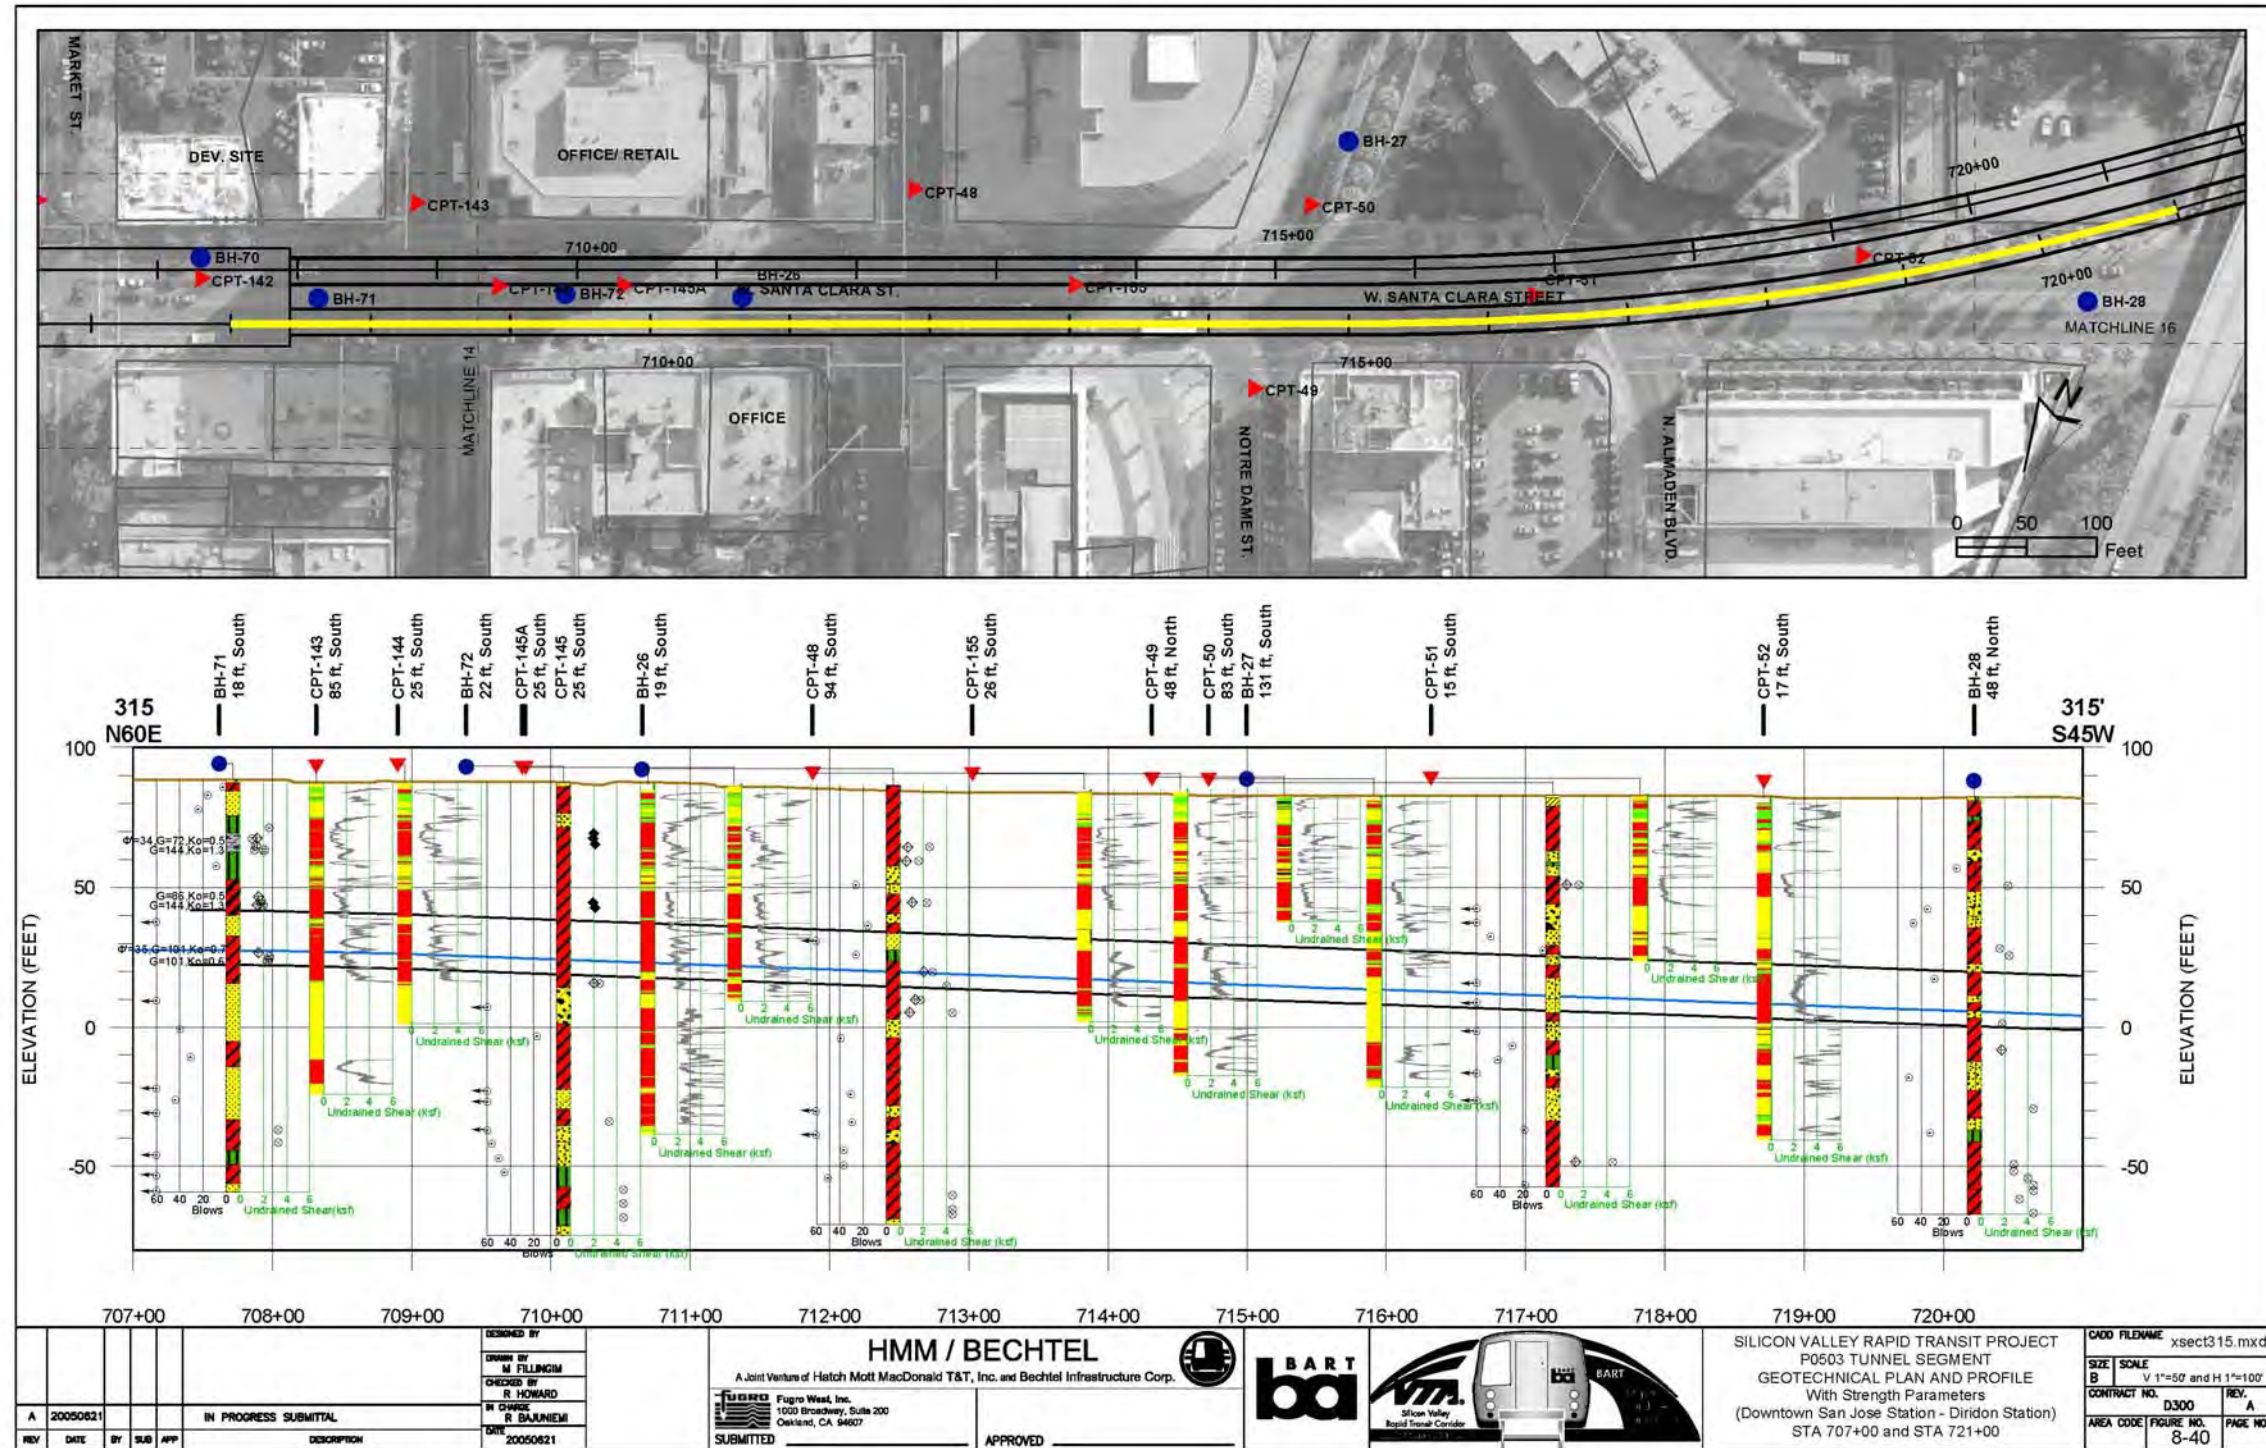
Geotechnical Plan and Profile with Strength Parameters: 707+00 to 721+00.
